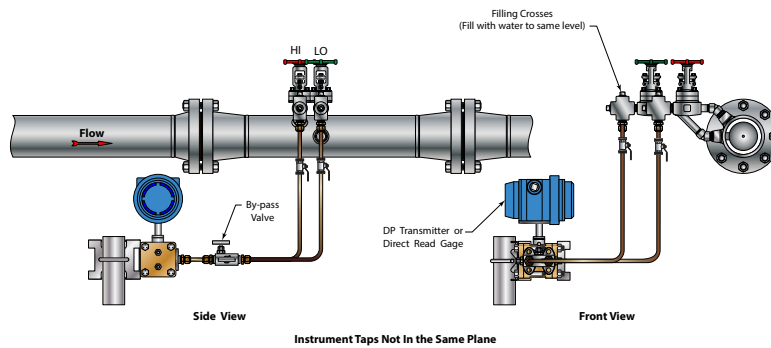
Optional horizontal installation for steam (instrument taps not in the same plane)
